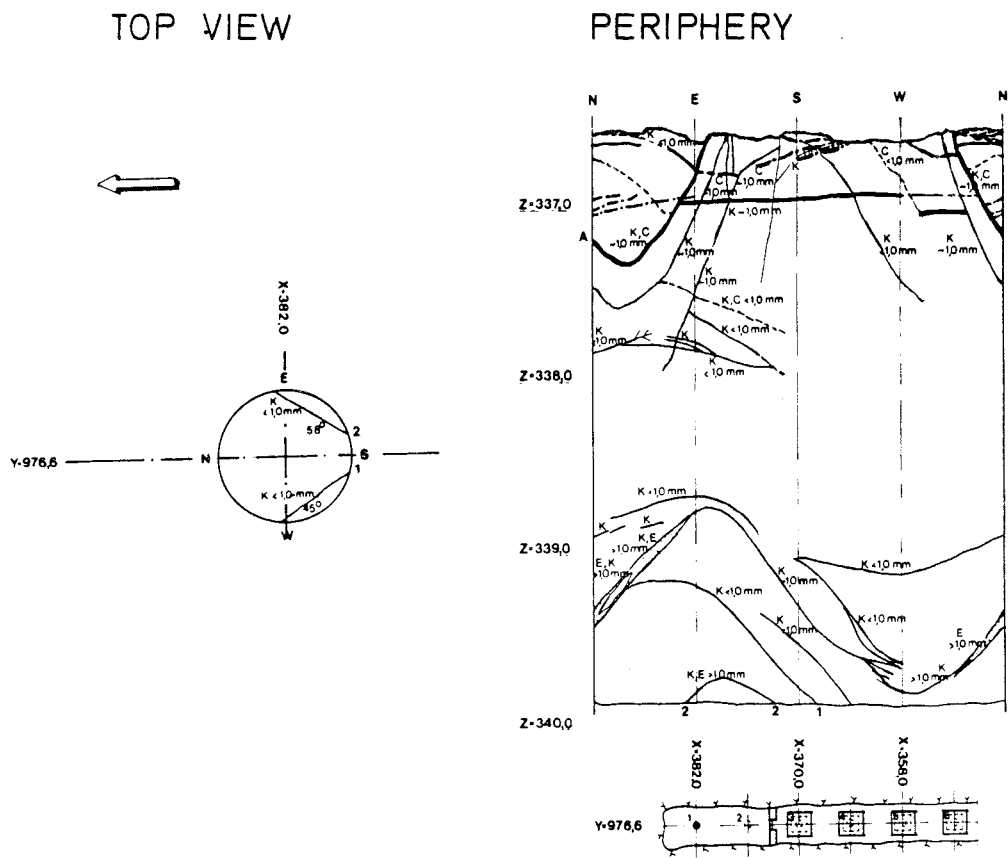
Major fractures exposed in the "wet" BMT hole no 1. Clearly waterbearing fractures are marked by heavy lines (14). Z-values give level in meters
